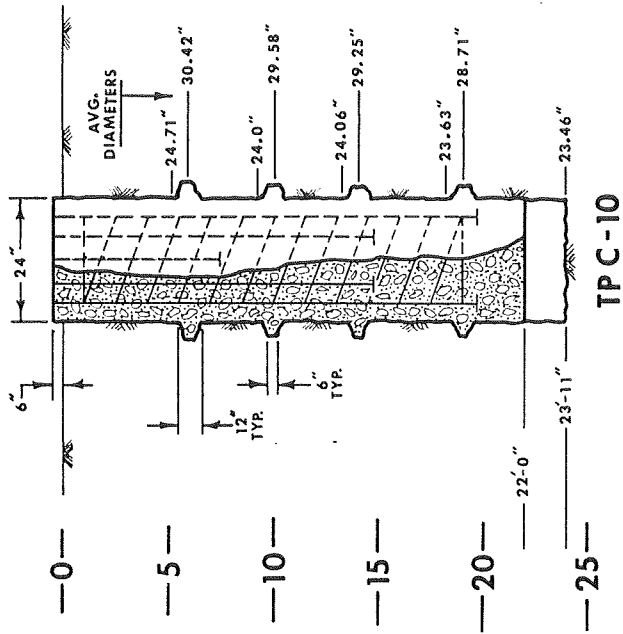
SCHEMATIC OF TEST PILES – SITE C
